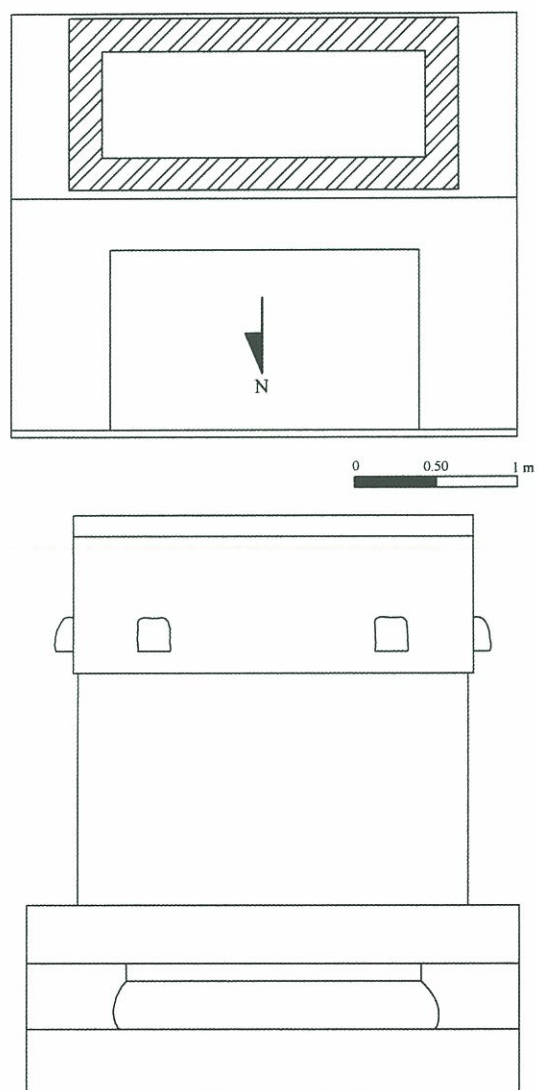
Apollonia, tomb with exedra 2, plan, facade elevation.
